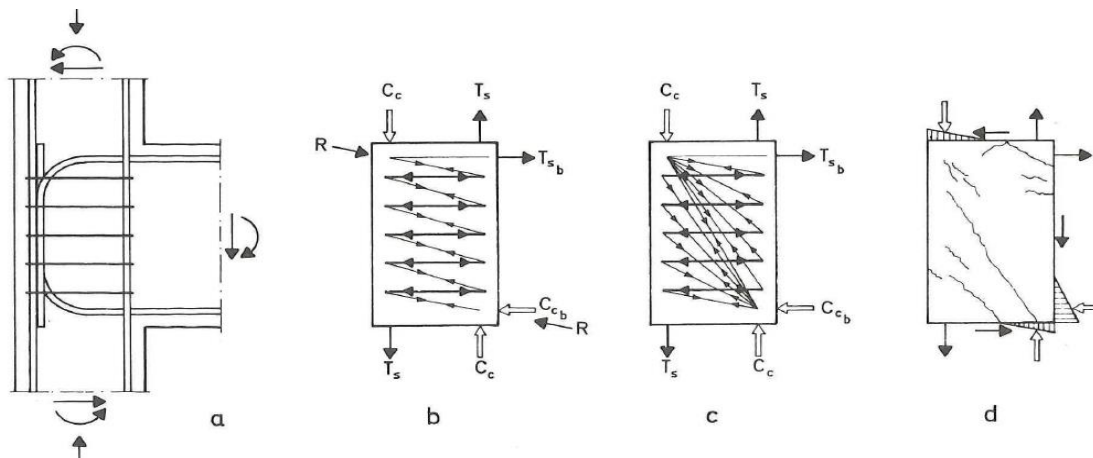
Beam-column T-joint connecting members with small width (Nilsson, 1973)
